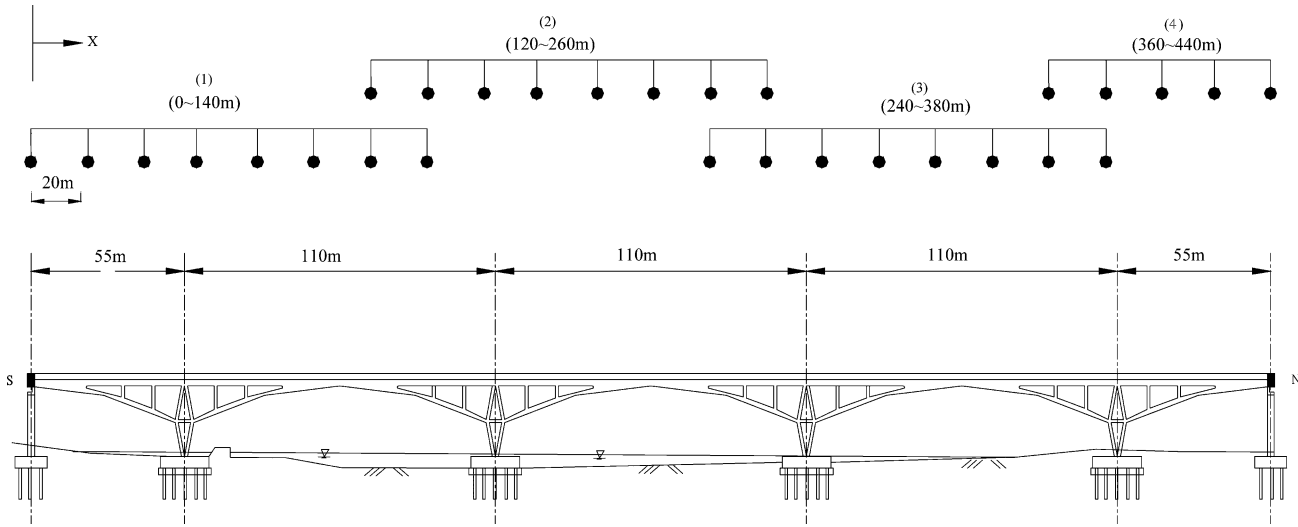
A sketch of the five-span arch bridge and sensor layout for impulsive tests.
